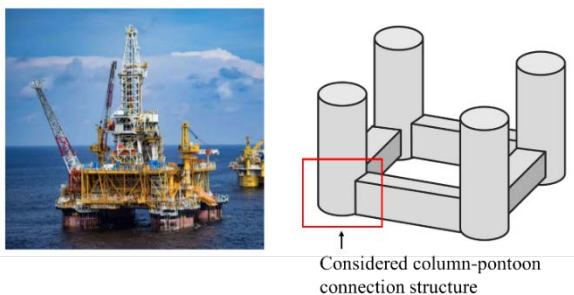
TLP installed in West Africa field [23] and schematic illustration of TLP hull with column and pontoon structures
